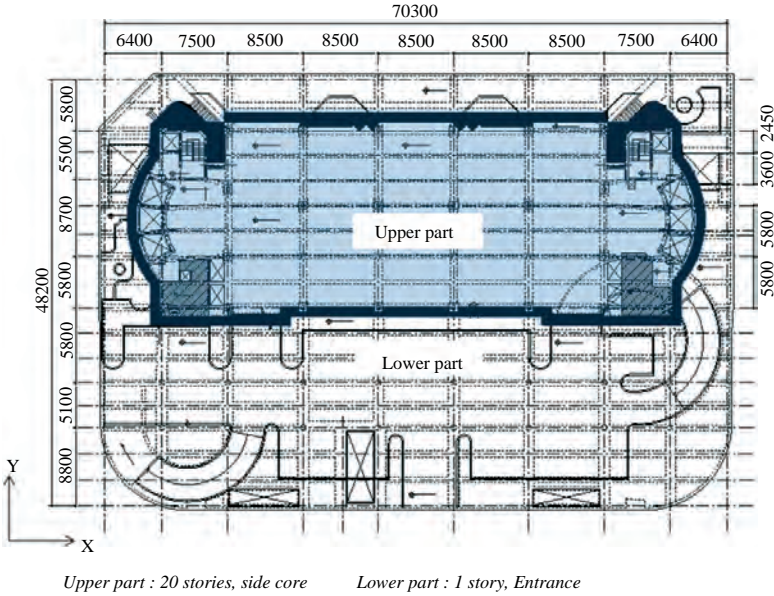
Plan design before rehabilitation (Units: mm)
